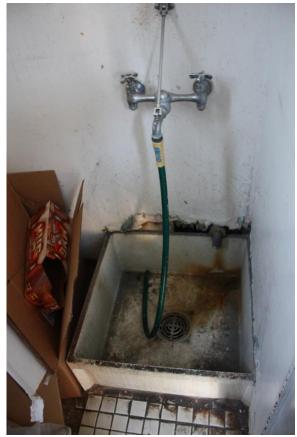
, Historic Courthouse, First Floor, Room 126, view of mop sink. Note heavy soiling and rusting at sink, heavily soiled floor, and hole at the plaster wall.
